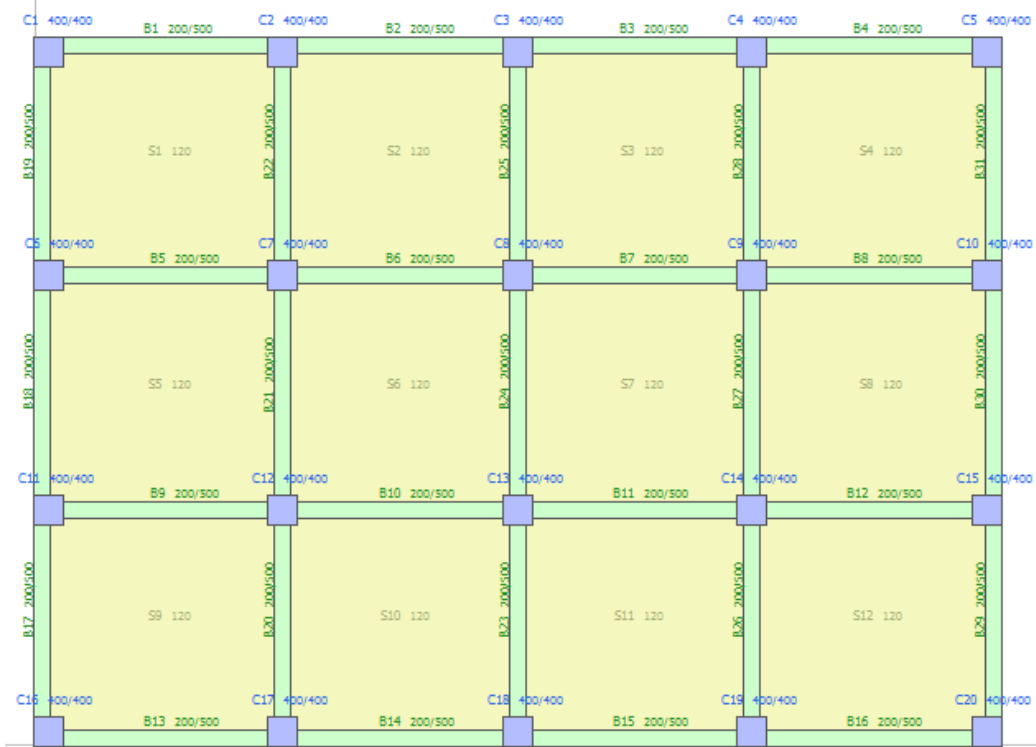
details of the Plan View of the Building from the Seismostruct
